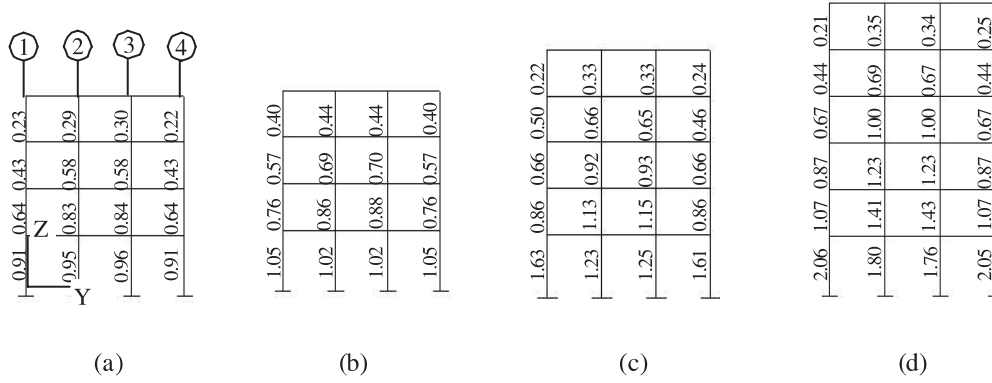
The column capacity ratios for axis A-A of F buildings: (a) 4-storey, (b) 4-storey with terrace floor, (c) 5-storey, (d) 6-storey building.
